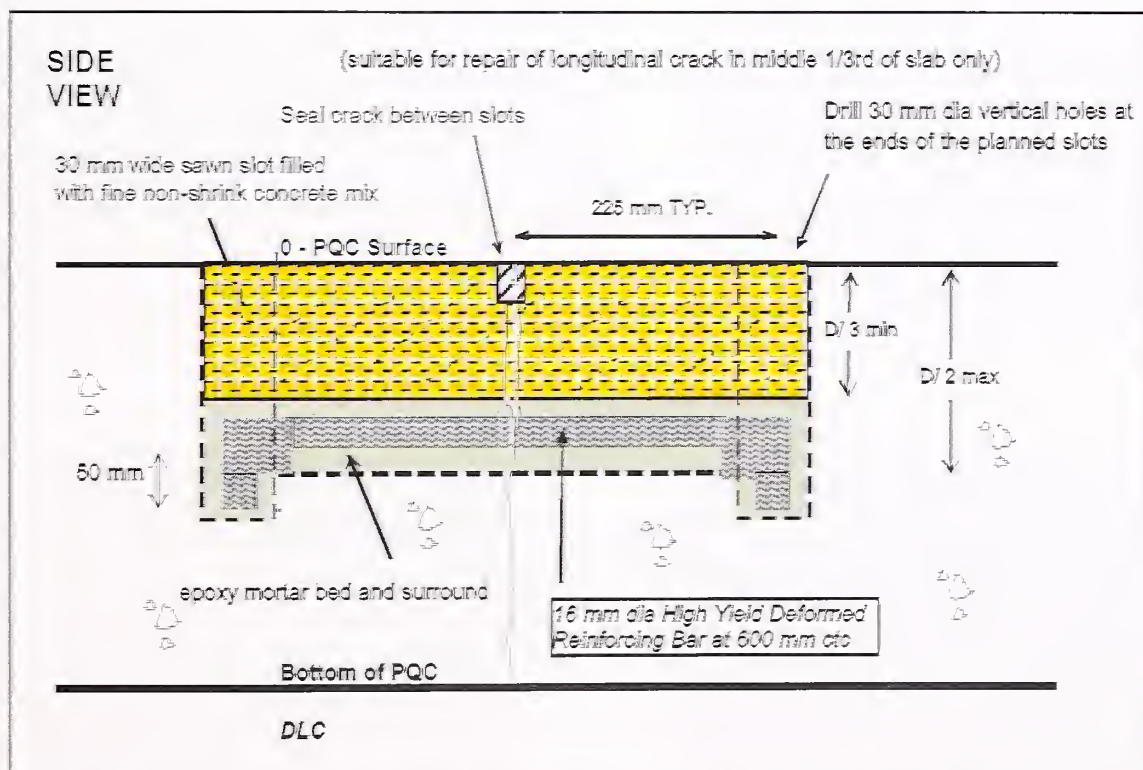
Typical Arrangement Stapling with 16 mm dia Tie bar
